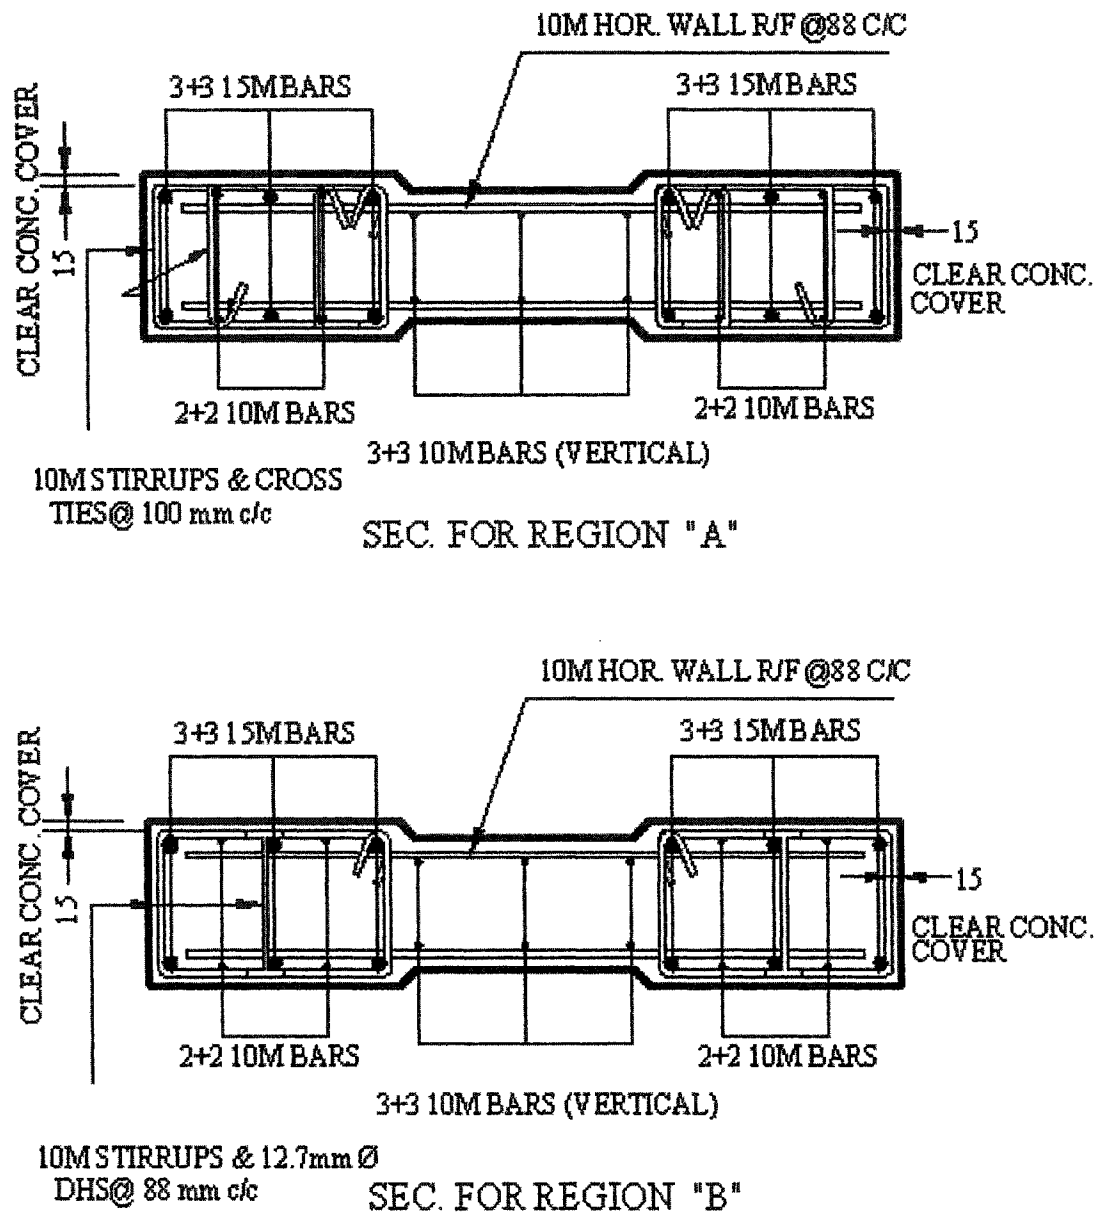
(b) W-3 Reinforcement detail in x-section
